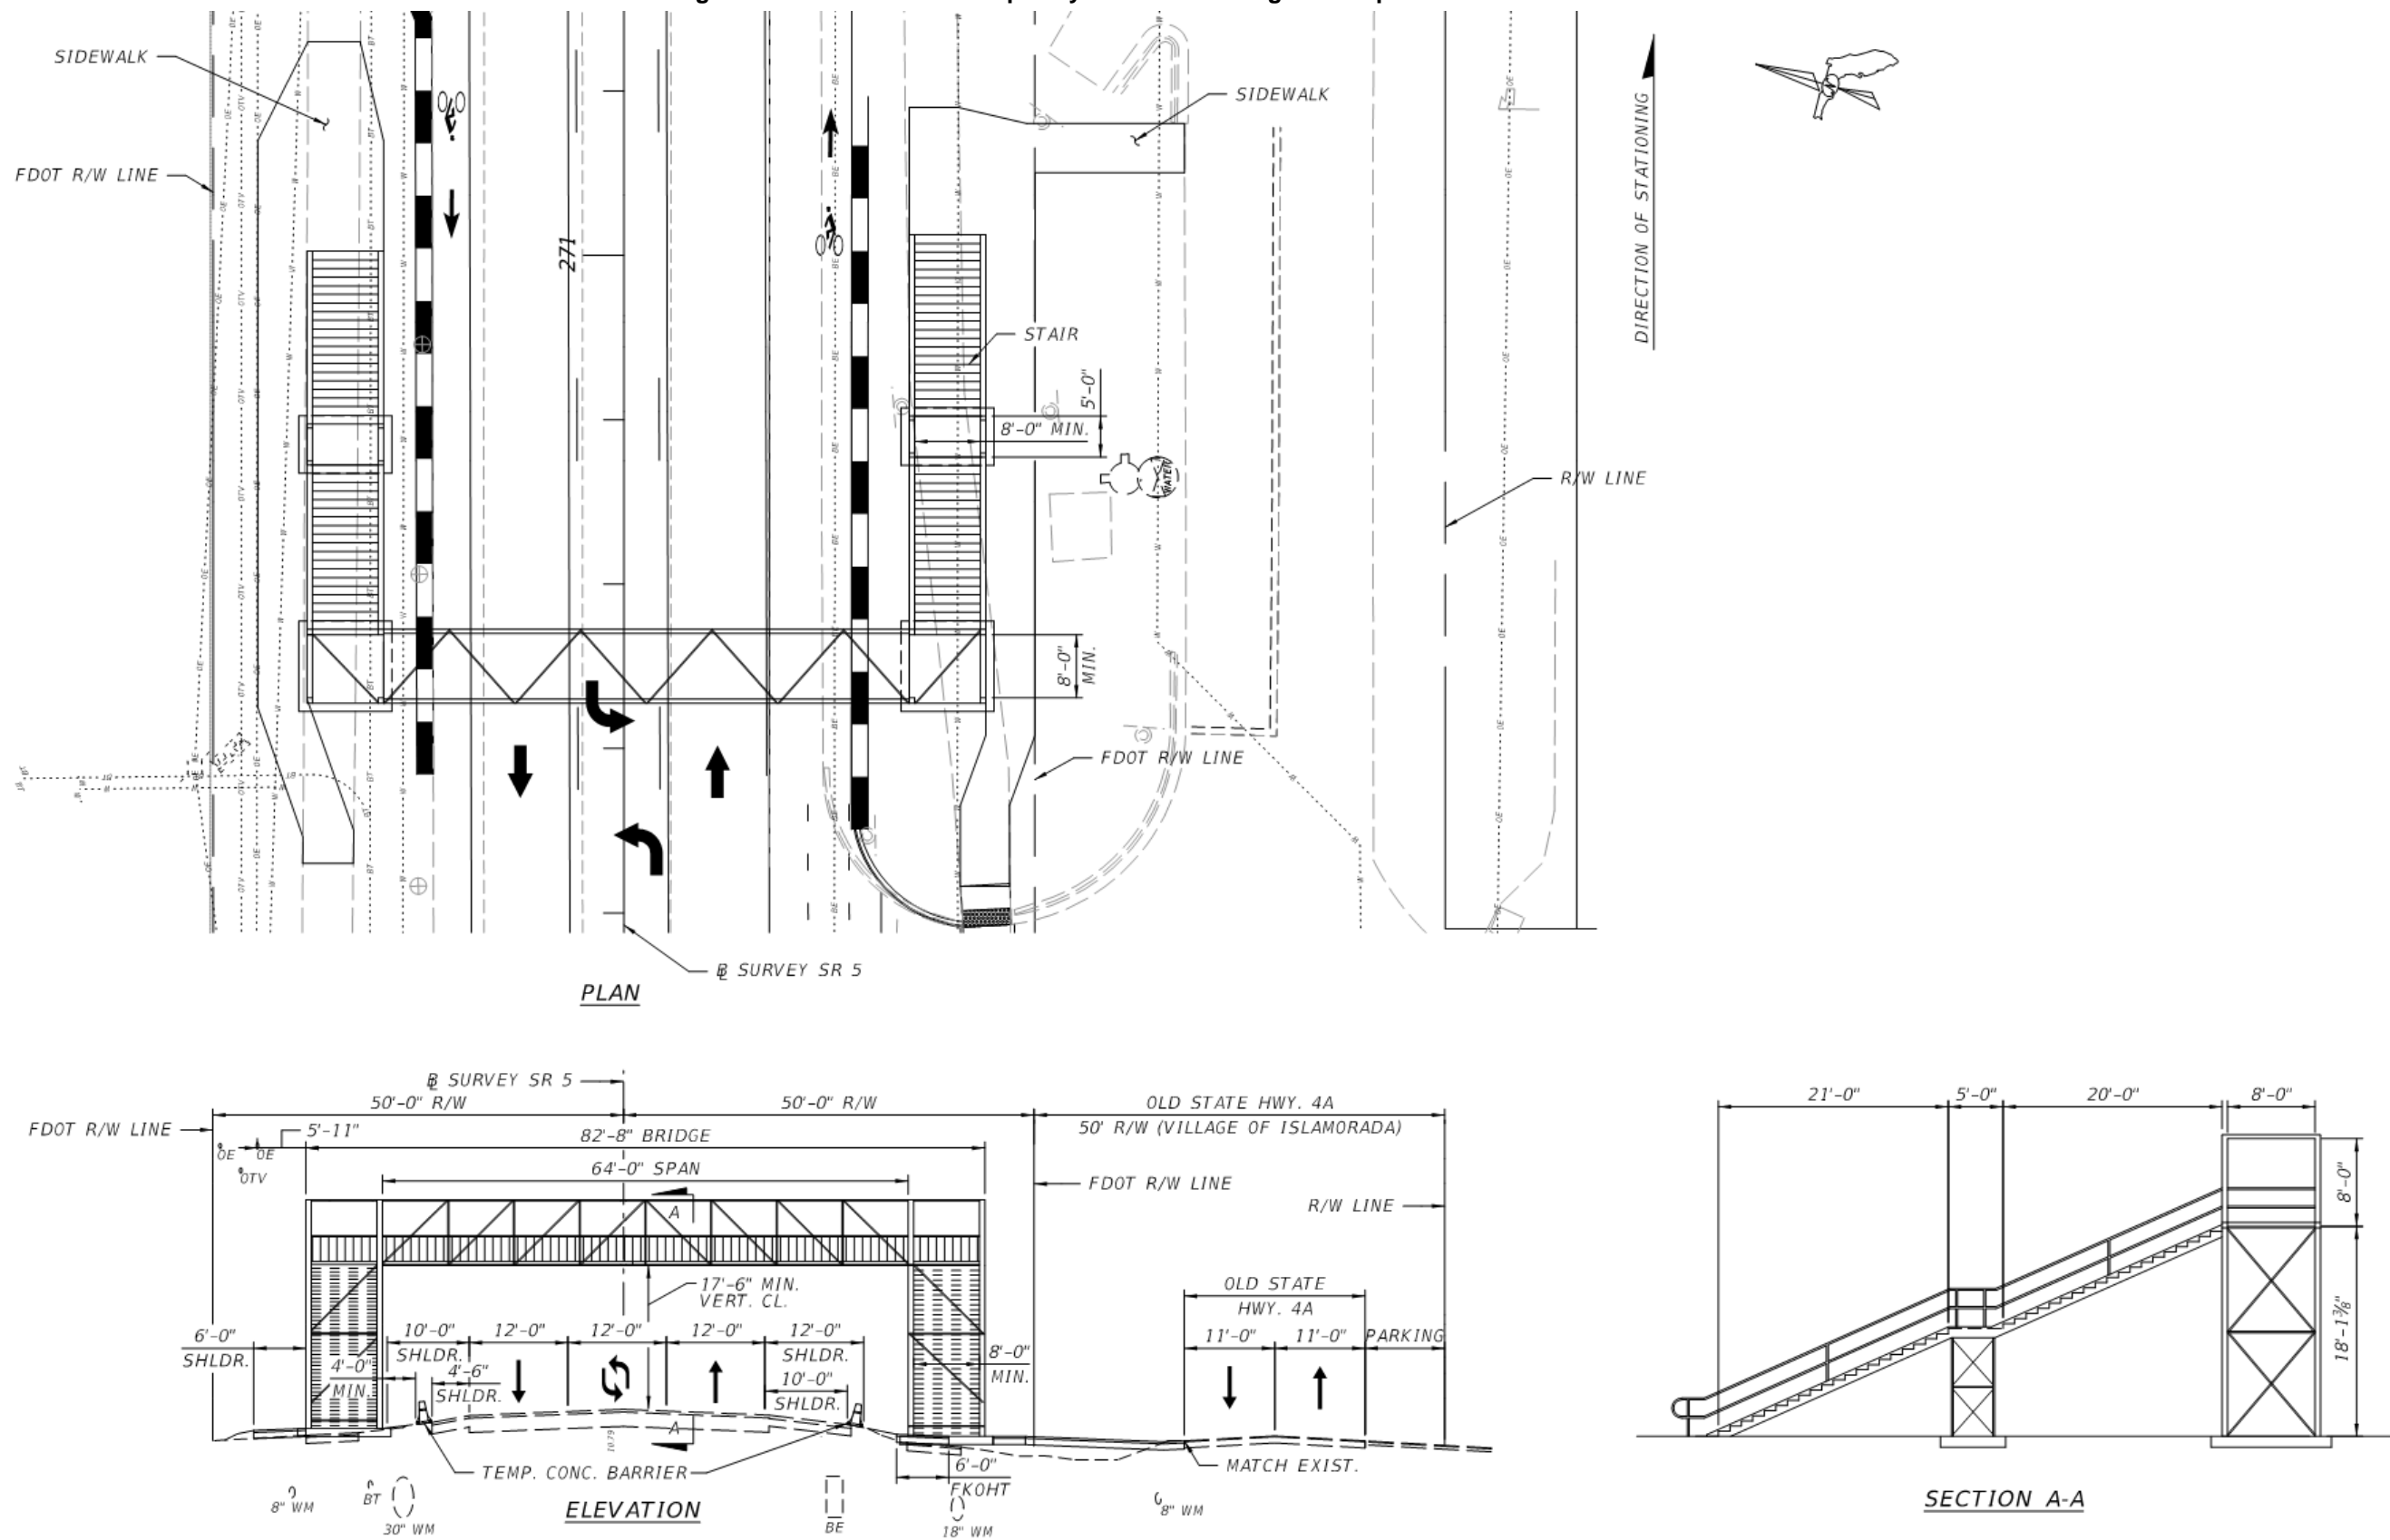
Location 4 Permanent Pedestrian Bridge Concept – Plan View
